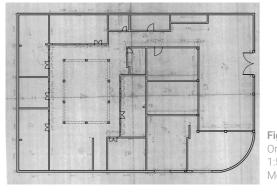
Survey plan Original house scale 1:500/ Source: Batuta Meta. Author's edition
